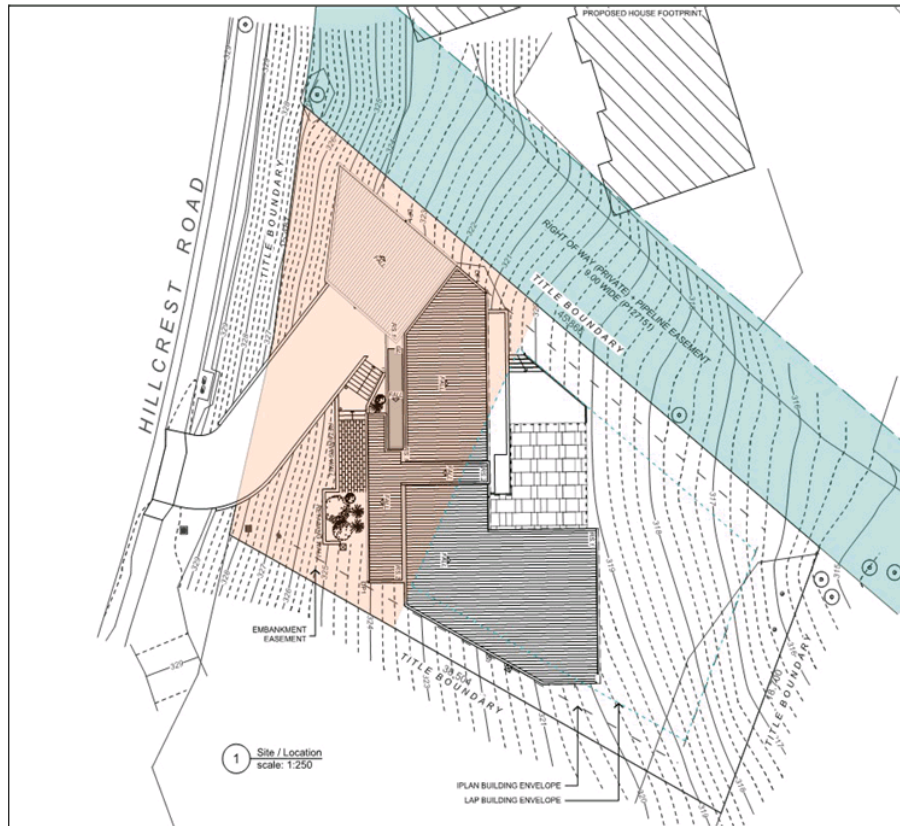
Site plan of proposed dwelling. The pink highlighted area is the extent of the existing embankment easement. The blue highlighted area is a right of way and pipeline easement, located within the adjoining property at 31 Hillcrest Road.
